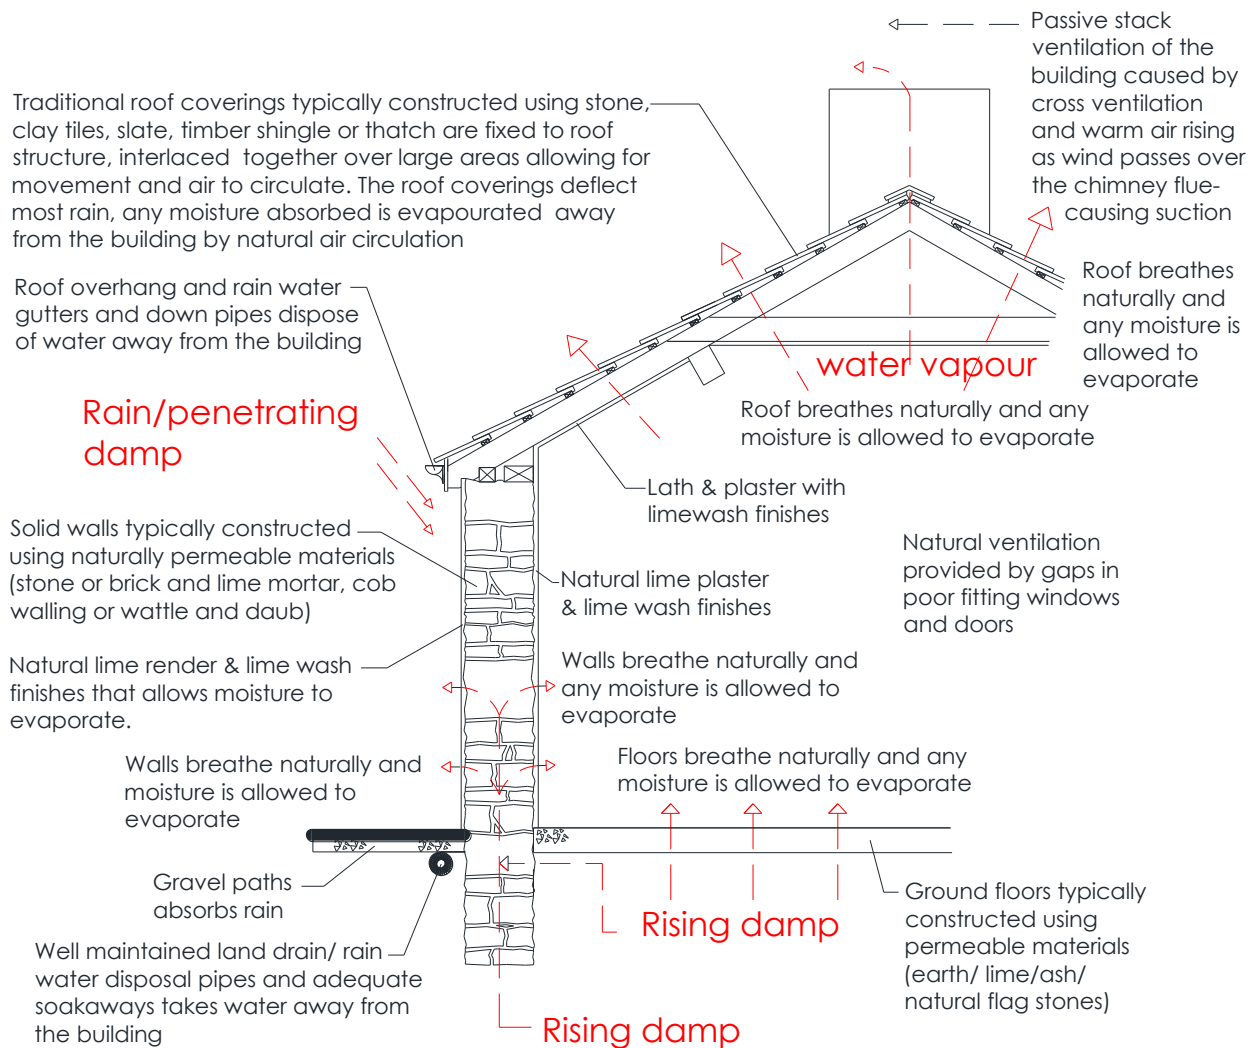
Typical section through a traditional 'breathing' building (Not to scale)
